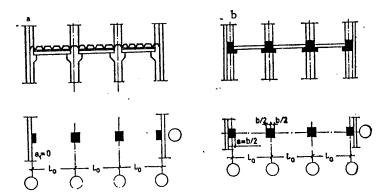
Examples of column and wall tie-ins of multistory buildings.
